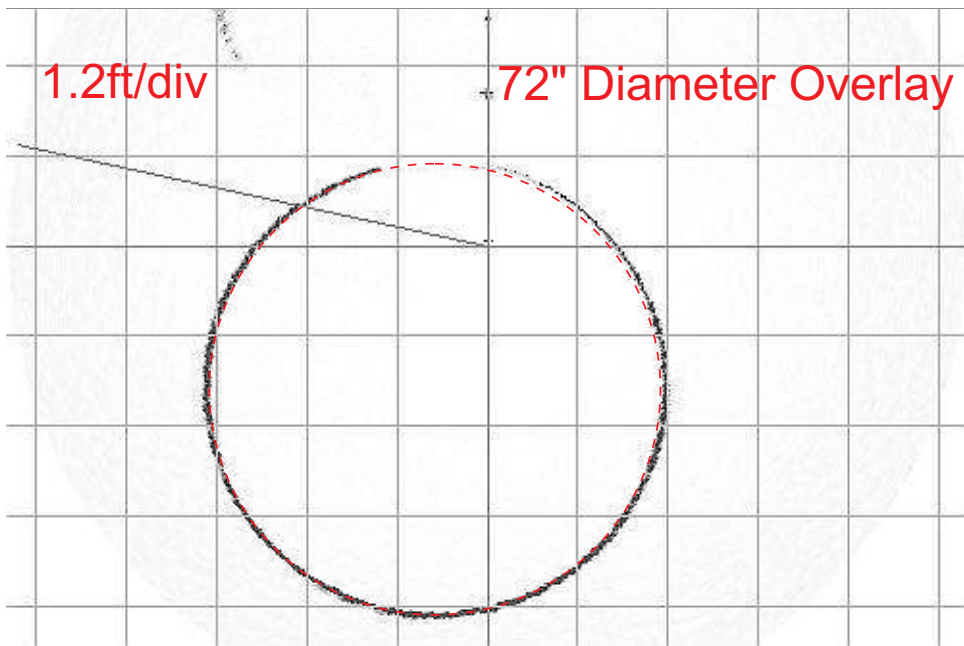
Sonar Profile 9 - 384 feet downstream of Access Point 1.
